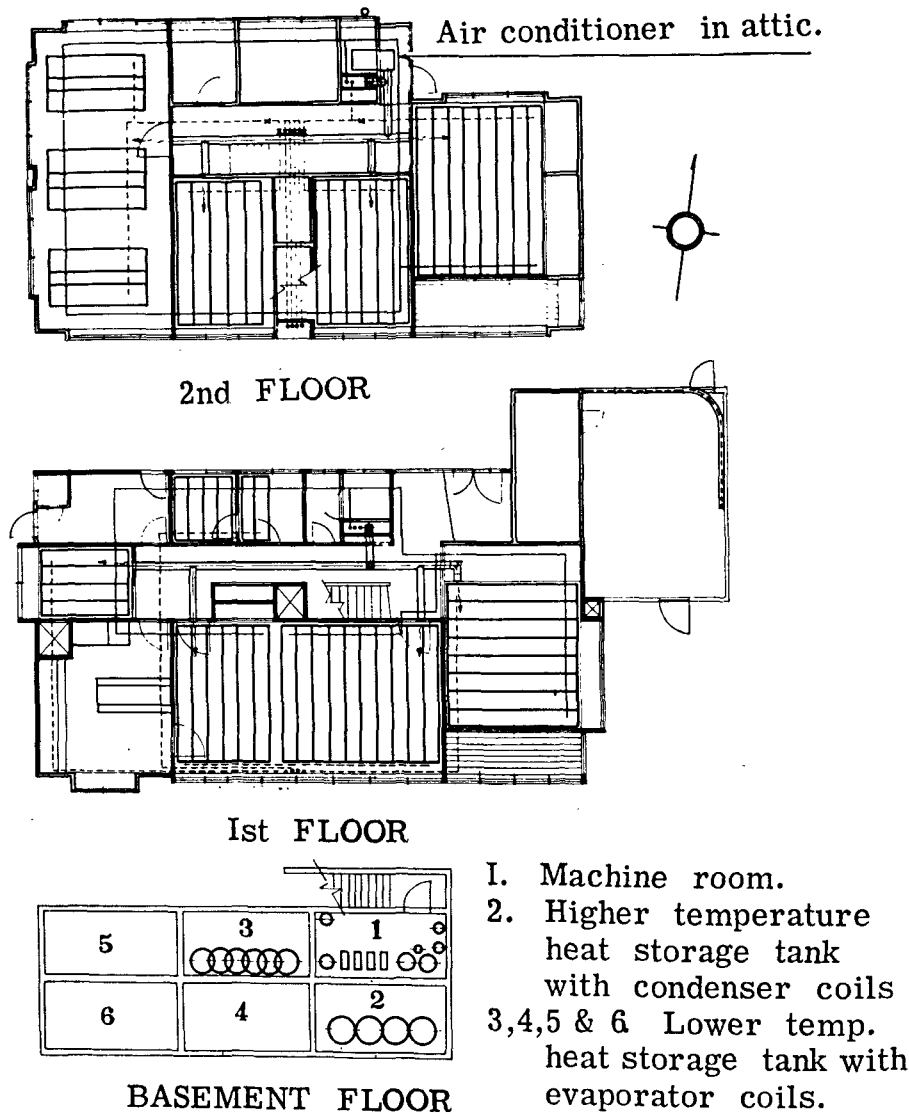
Arrangement of the solar system, including radiant ceiling panels, air conditioner, air duct, machinery and heat storage tanks
